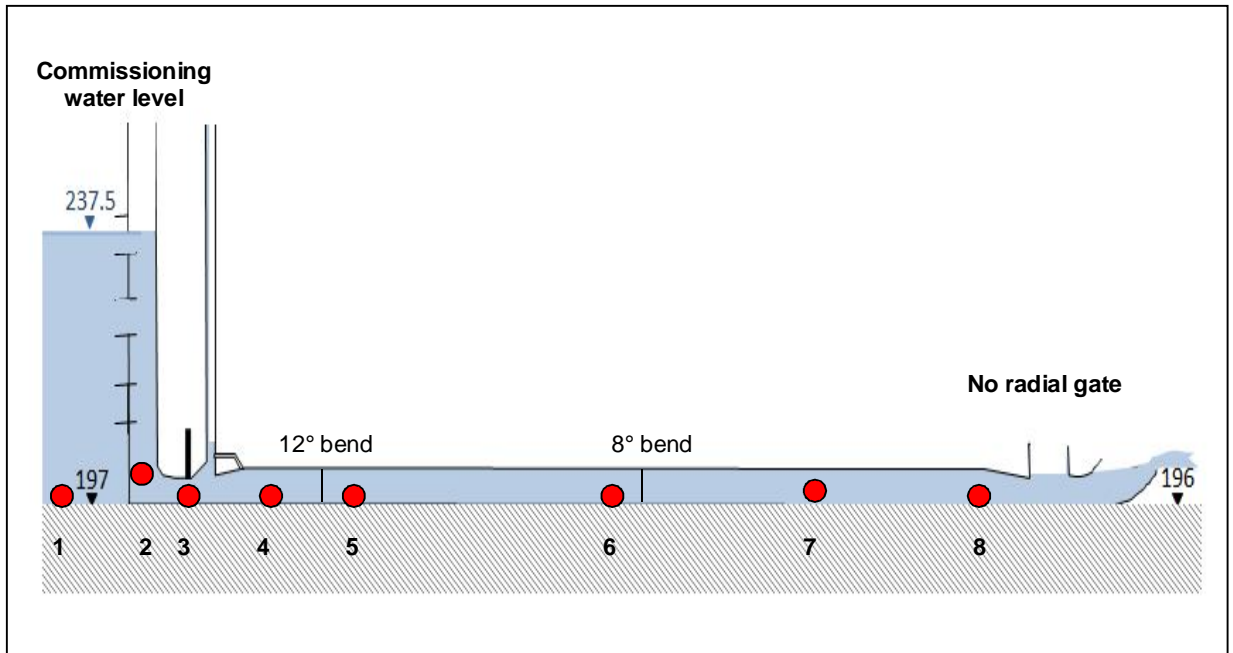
Positions of pressure transducers (sectional elevation view)
